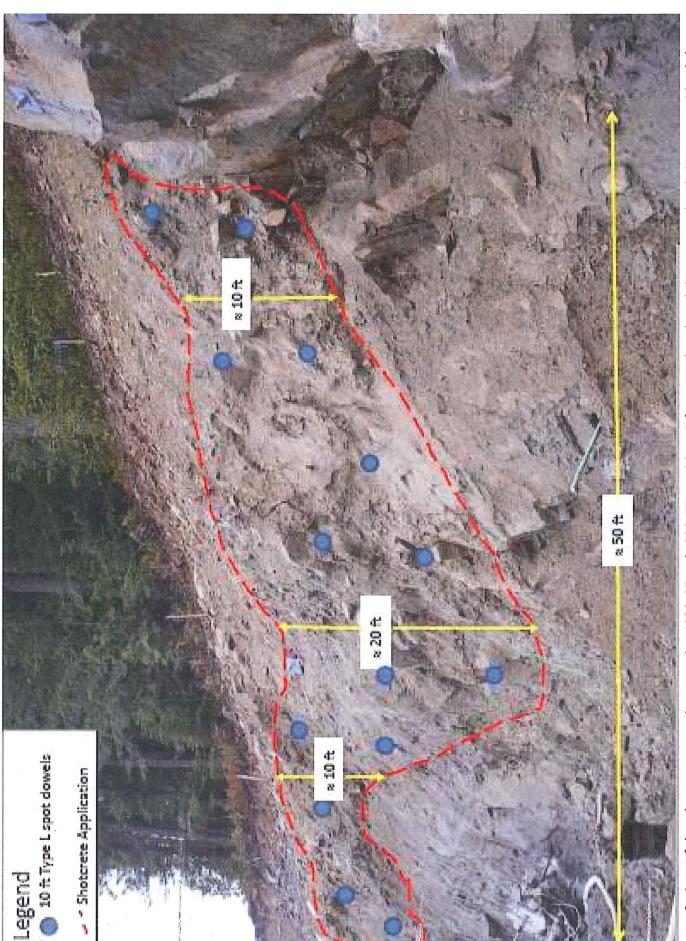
Area of slope between approximate station 1338+25 and 1338+75 requiring 10-foot spot dowels and shotcrete as detailed in Marc Fish's 9/9/10 IDR.
